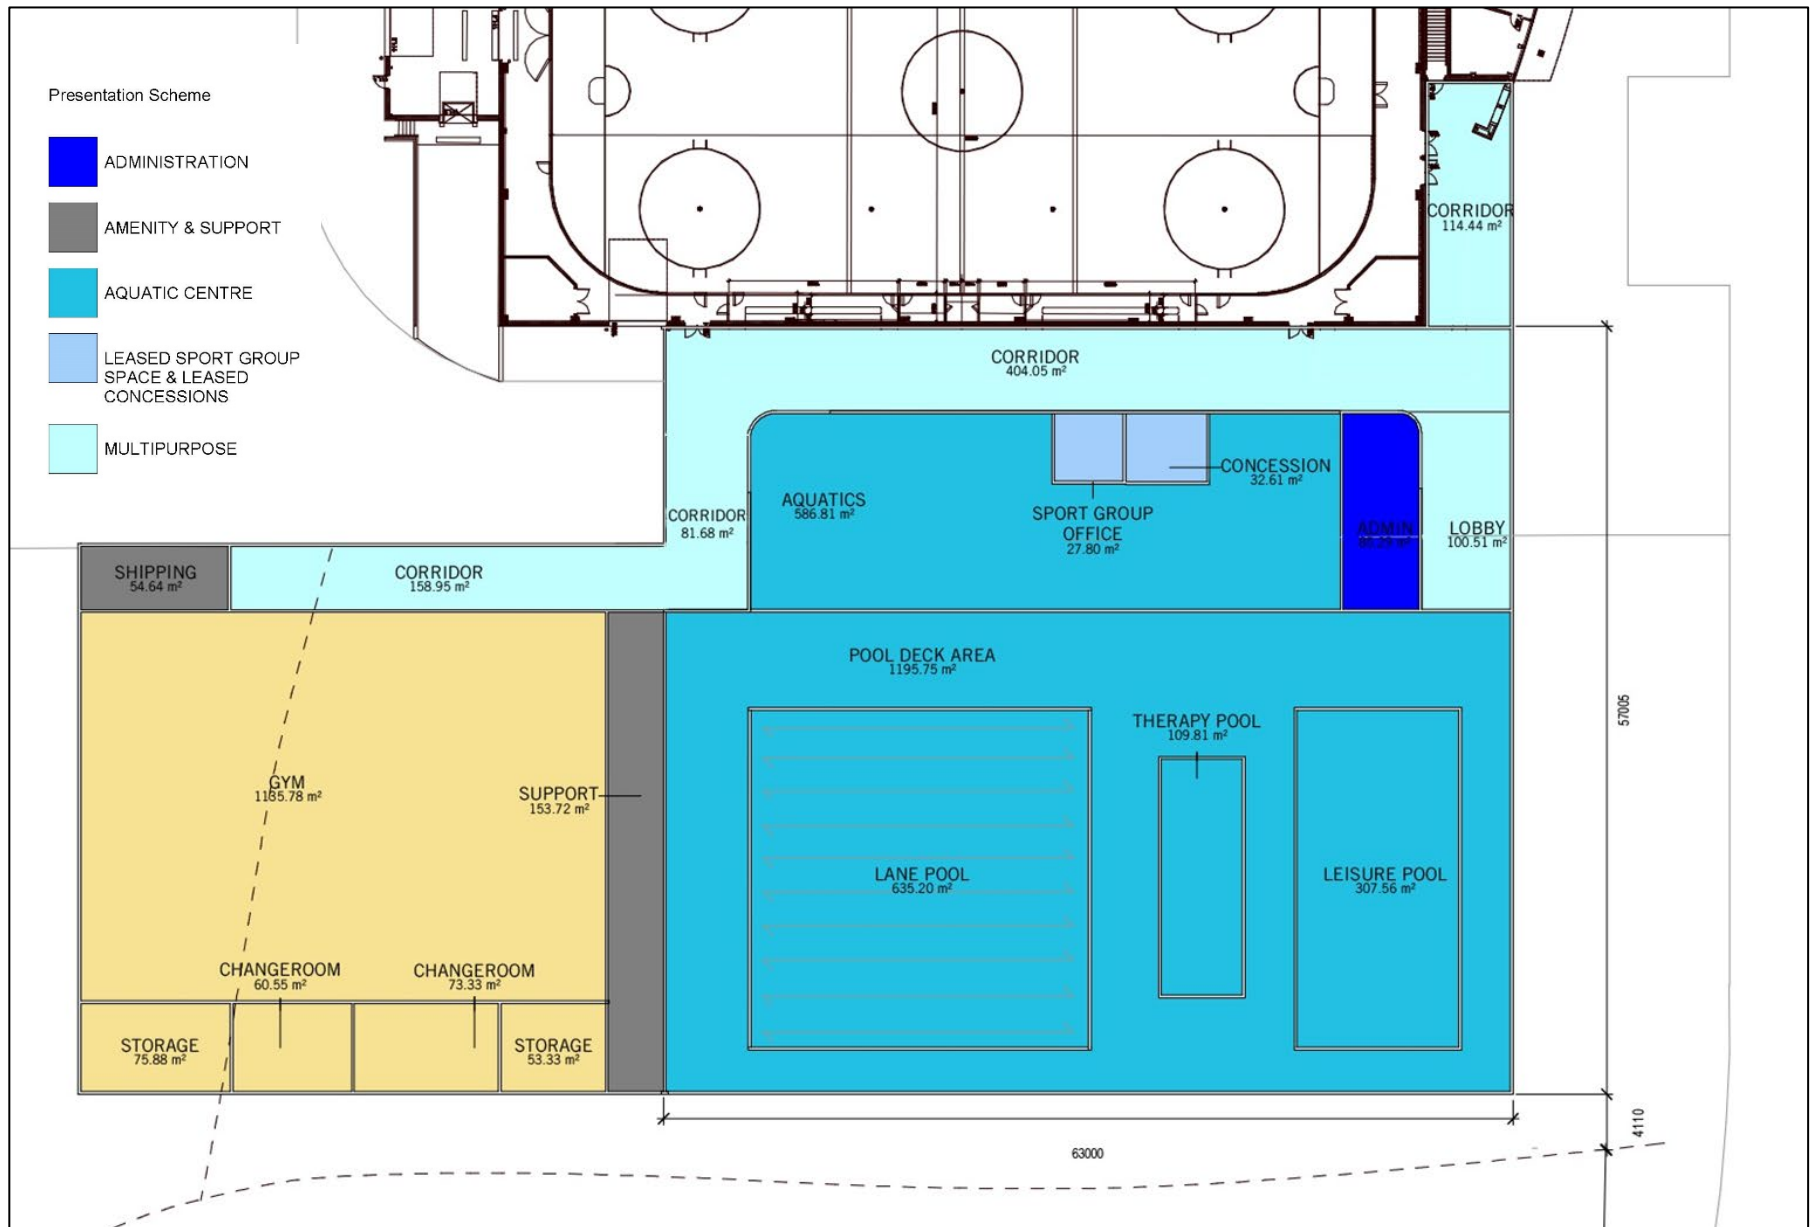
Option 1 – Main Floor Concept Plan (Aquatics and Gymnasium)
